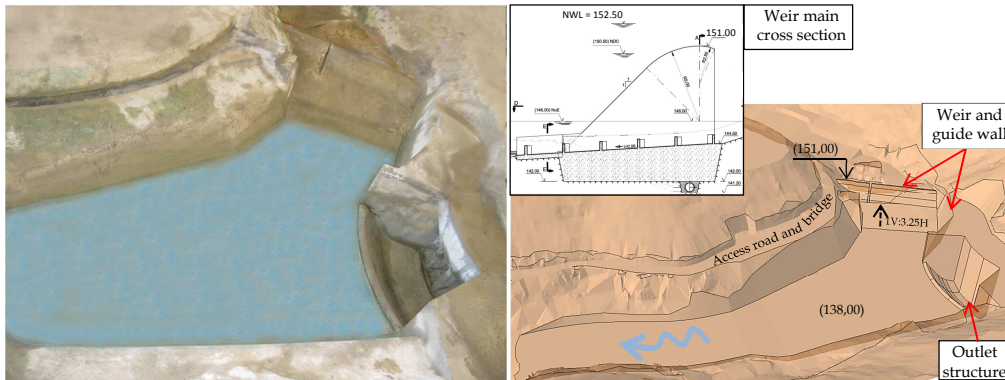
Proposed Forms*: physical model photo, 3D preview and weir main cross section.
